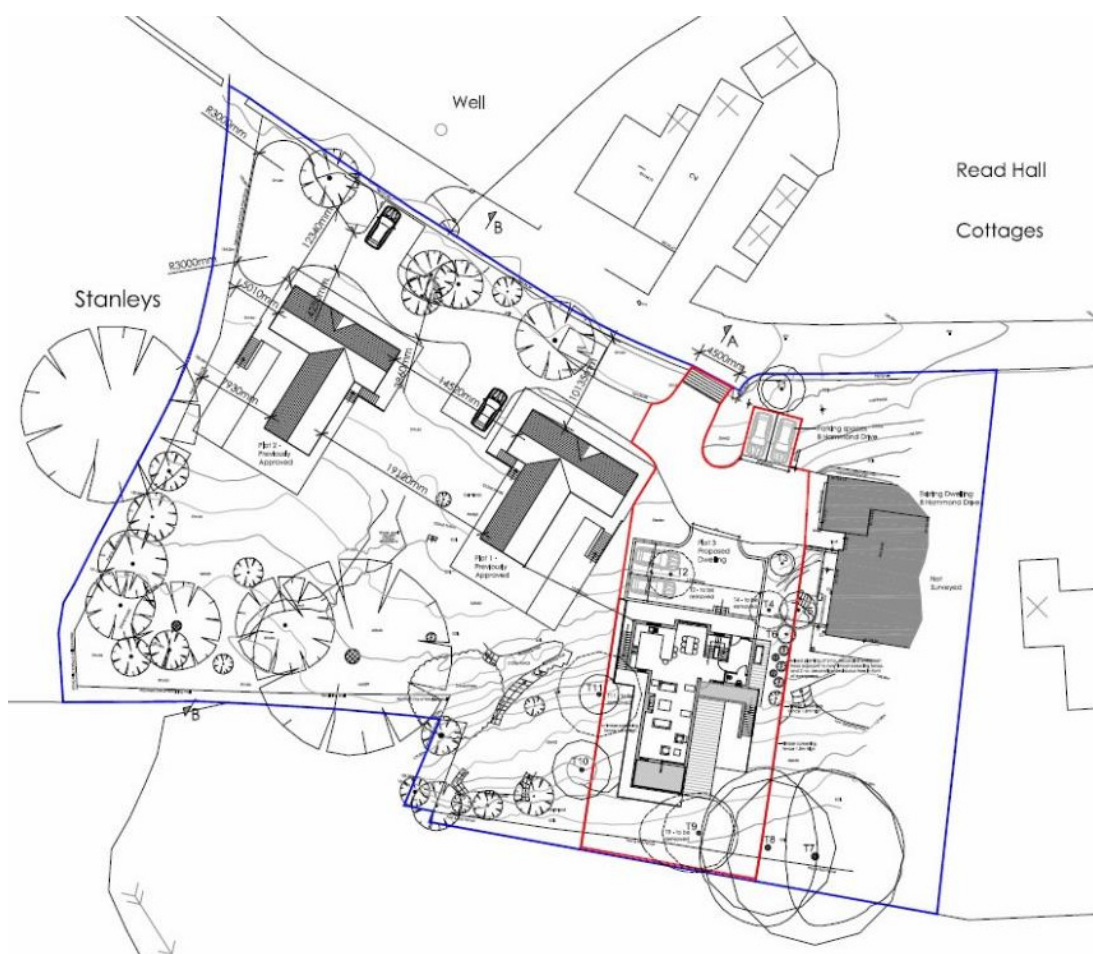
Extract of approved Site Plan under Permission Ref: 3/2014/0751, showing the three consented dwellings in relation to Swiss Cottage
